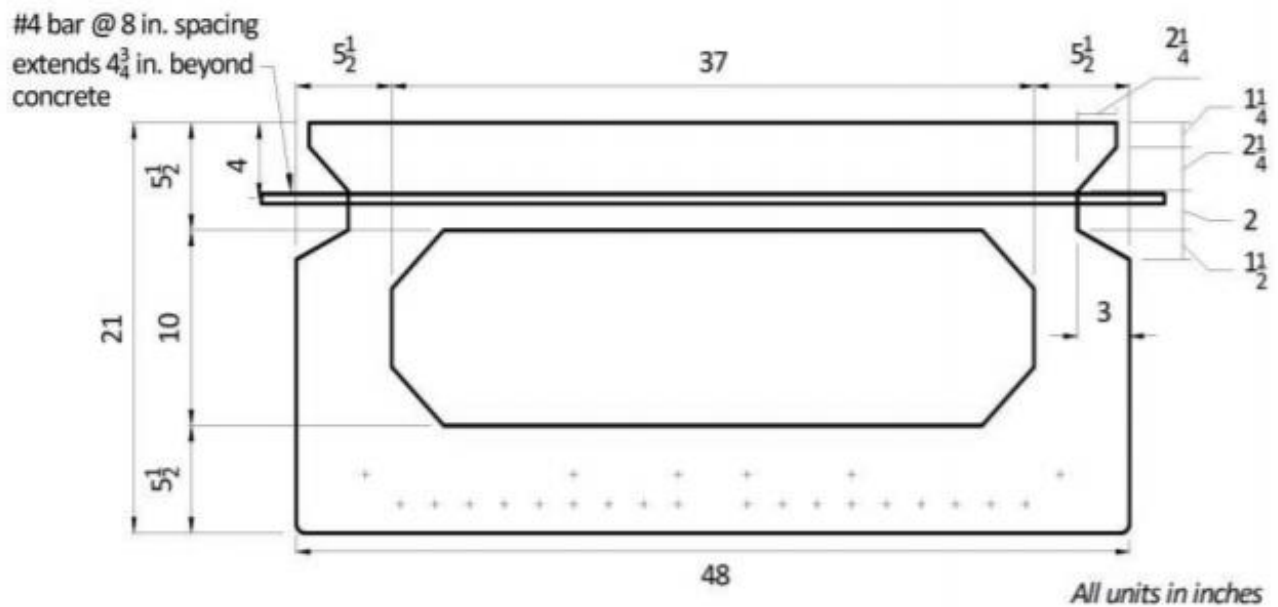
UHPC Adjacent Box Beam Connection (Graybeal, 2014)
